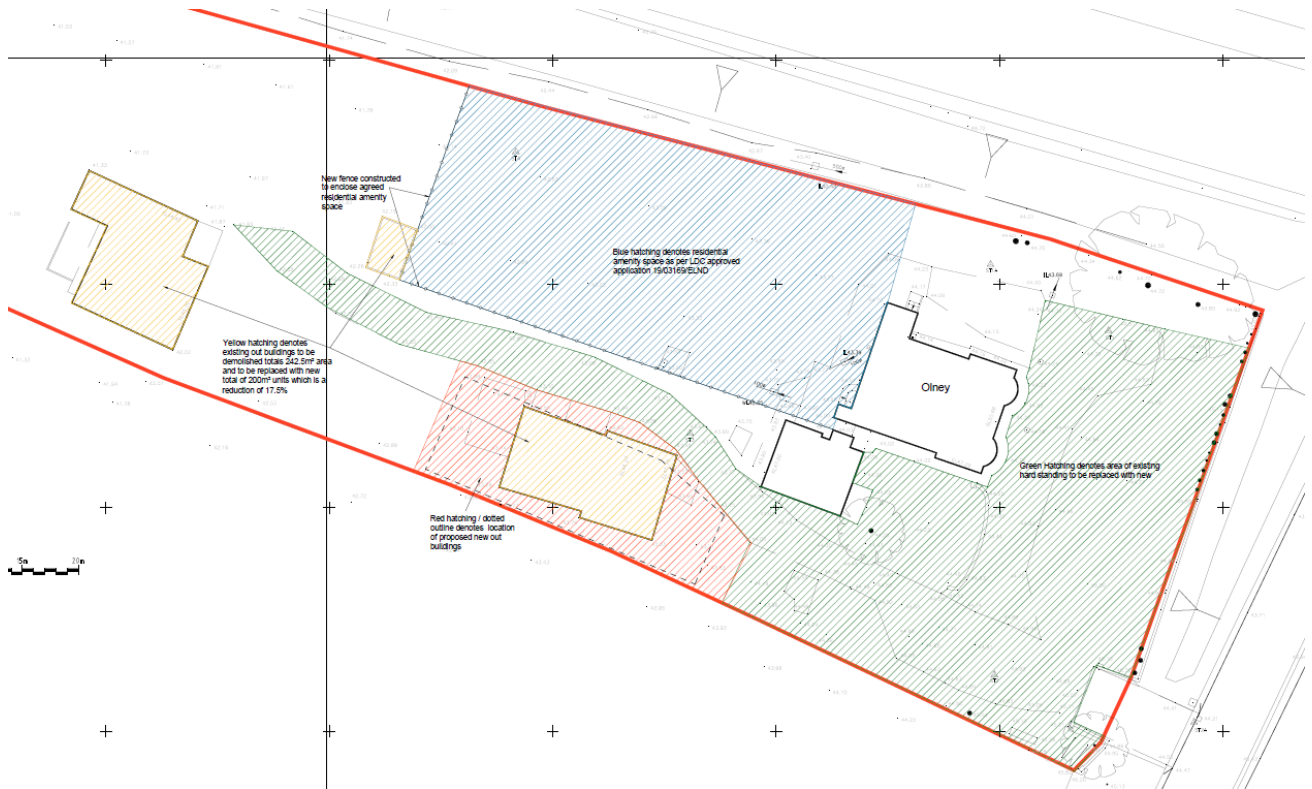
Proposed Site Plan (Existing outbuildings to be demolished in yellow, proposed outbuilding in red)
